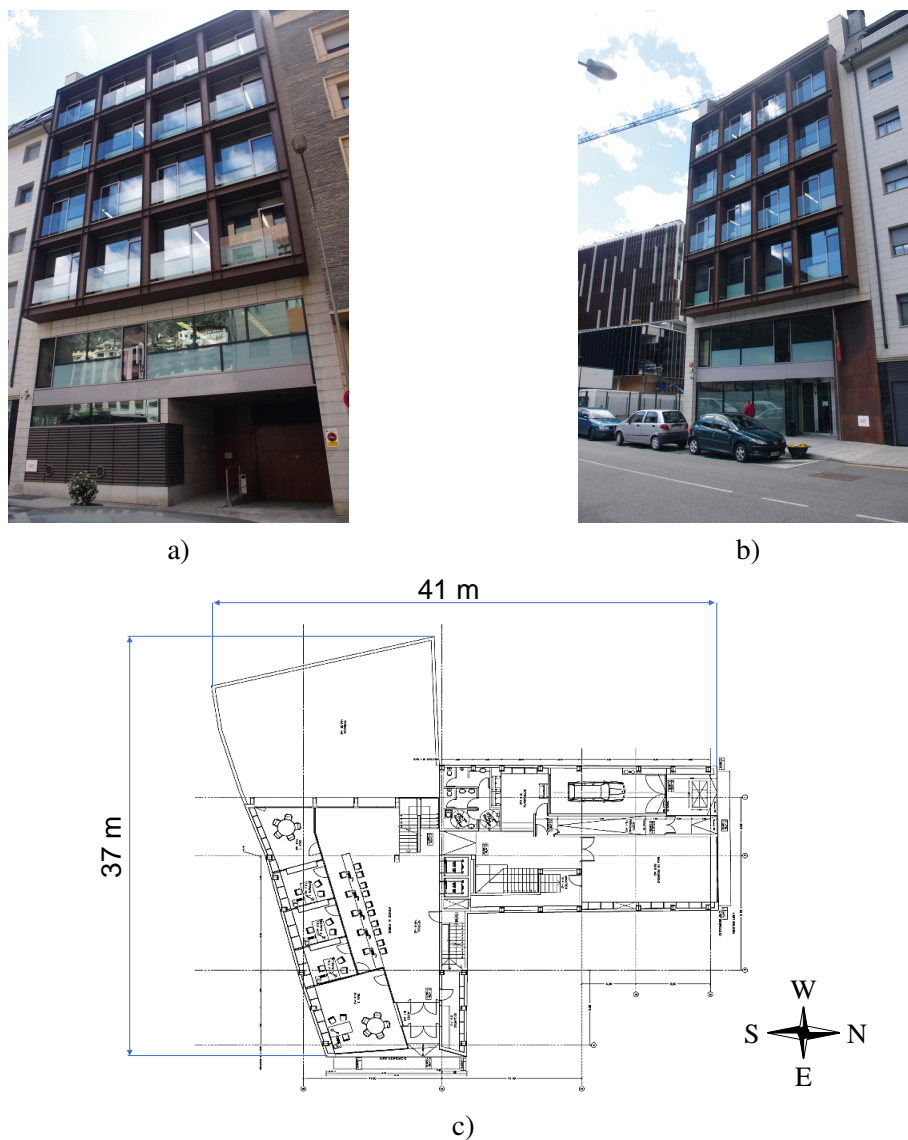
Edifici administratiu del Prat del Rull : (a) north facade, (b) east facade and (c) basement map
